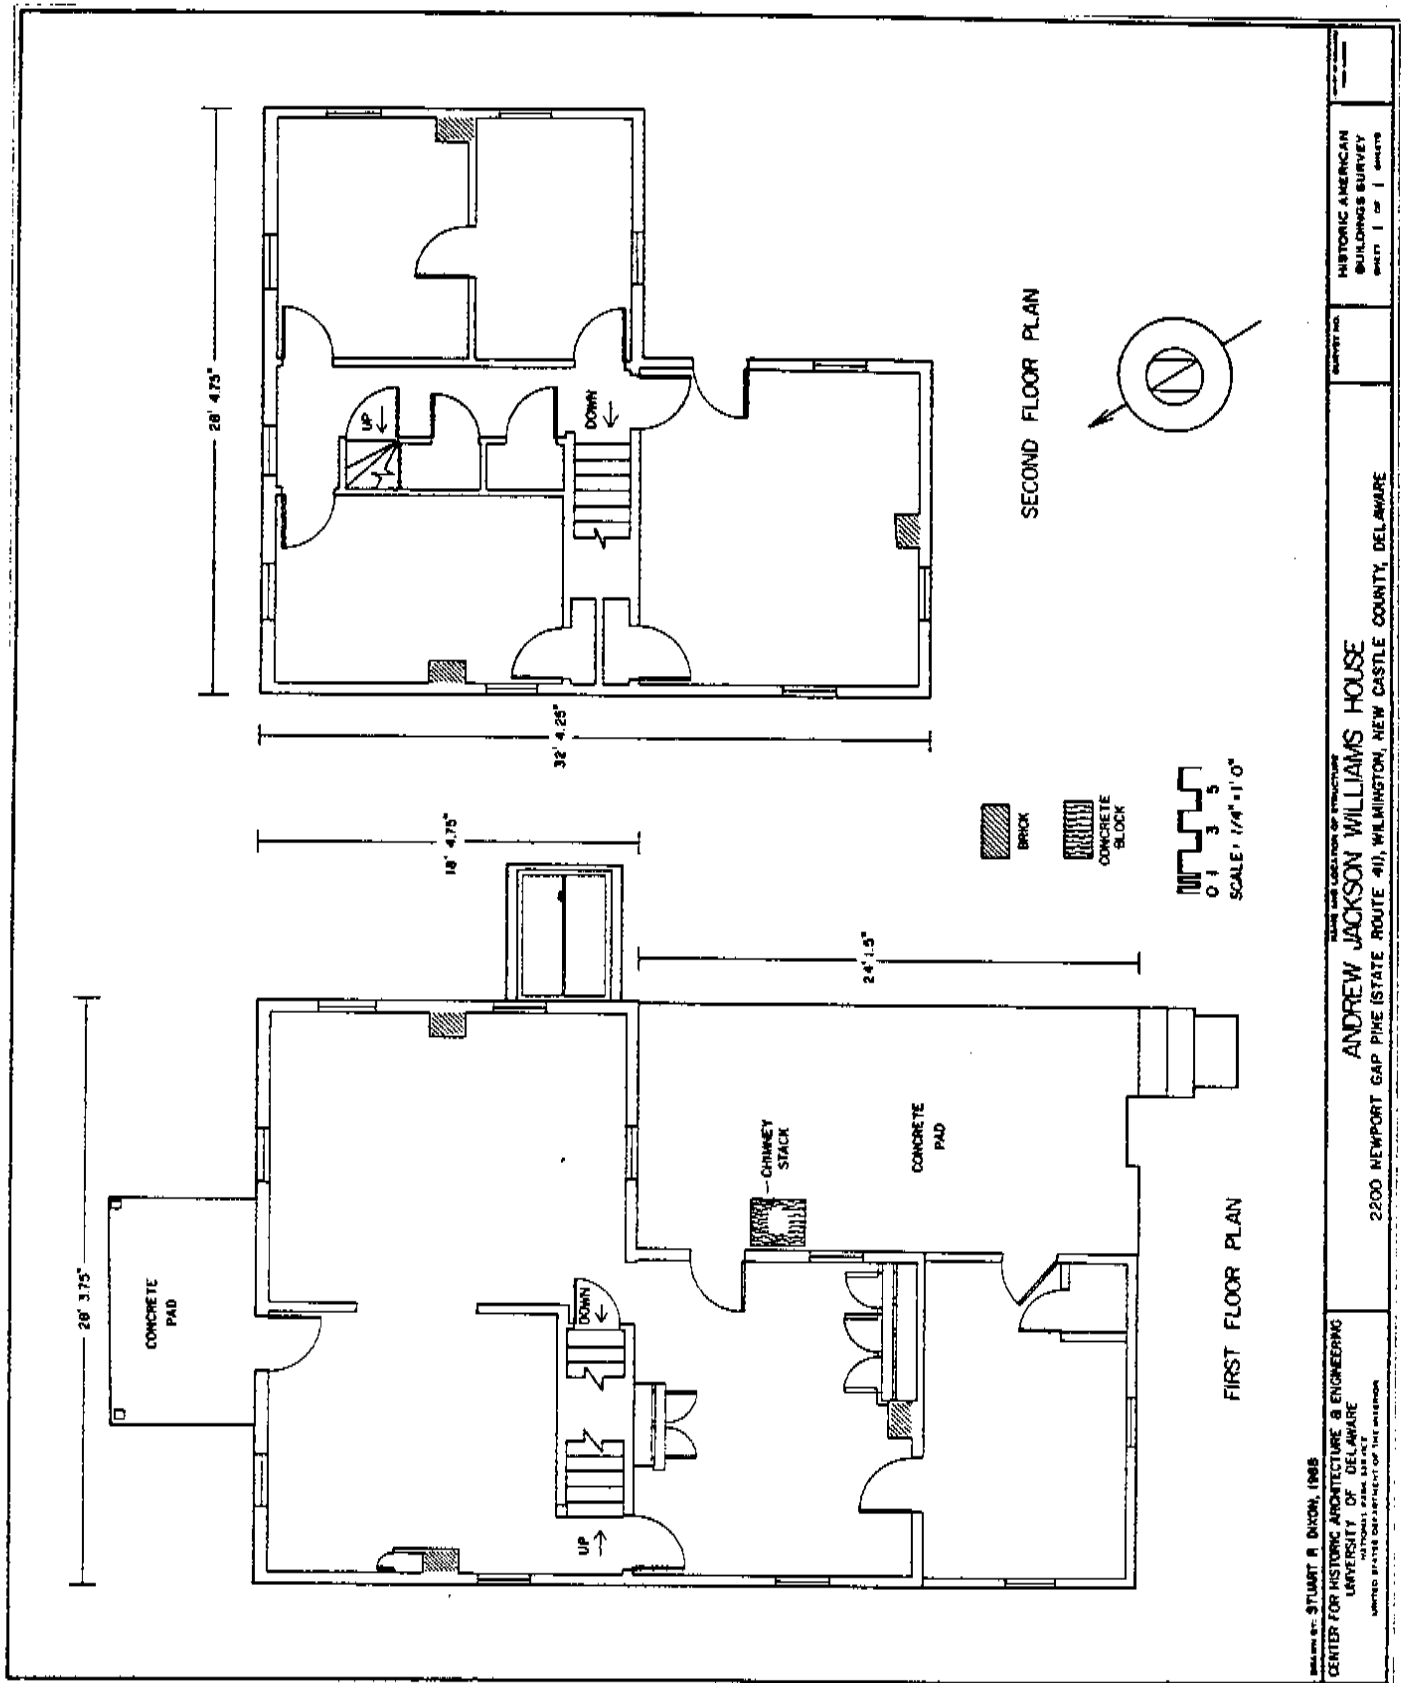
Floor Plan of the Williams House (Drawn by Stuart Dixon)
